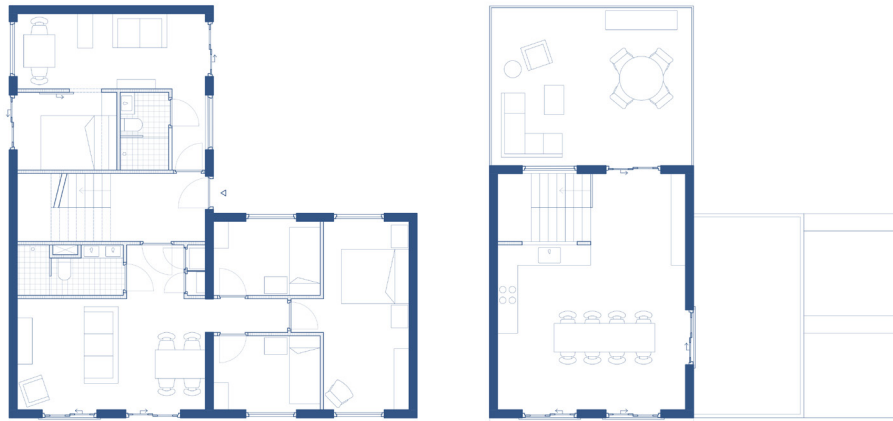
Ground Floor Plan (Left) and First Floor Plan (Right)
